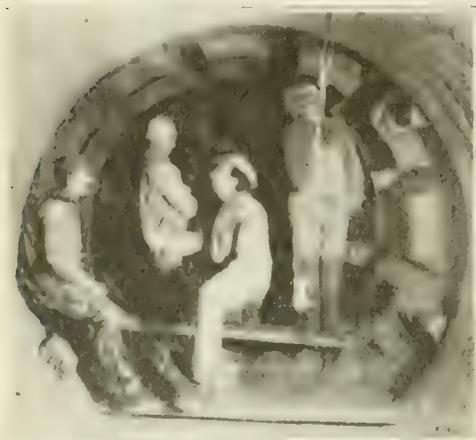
View of Hydraulic Shield Used in Driving Original Mystic River Water Tunnel in 1900.
